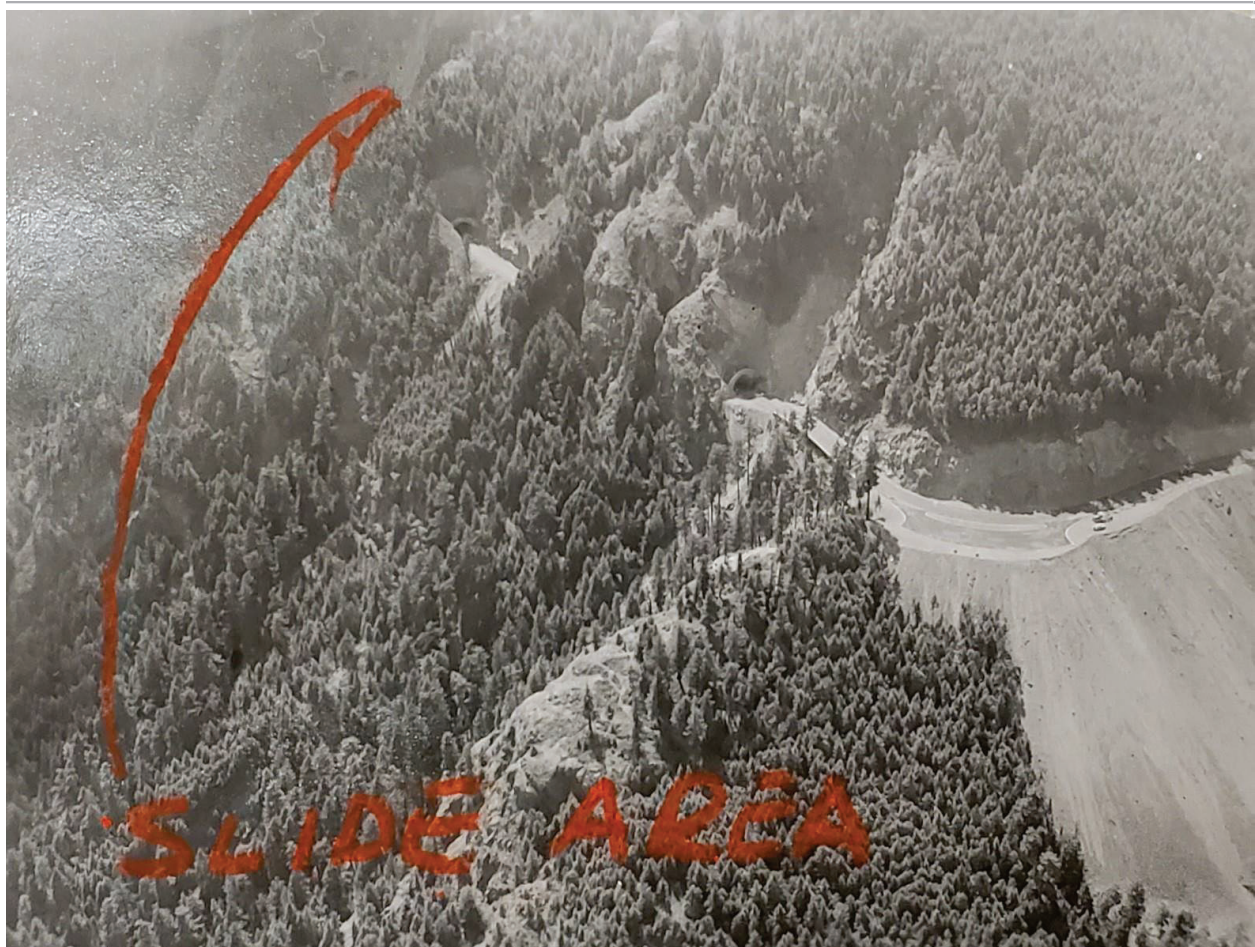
The unstable slope between Tunnels #2 and #3 posed a danger to drivers when the road was completed in 1958. National Park Service photo.
